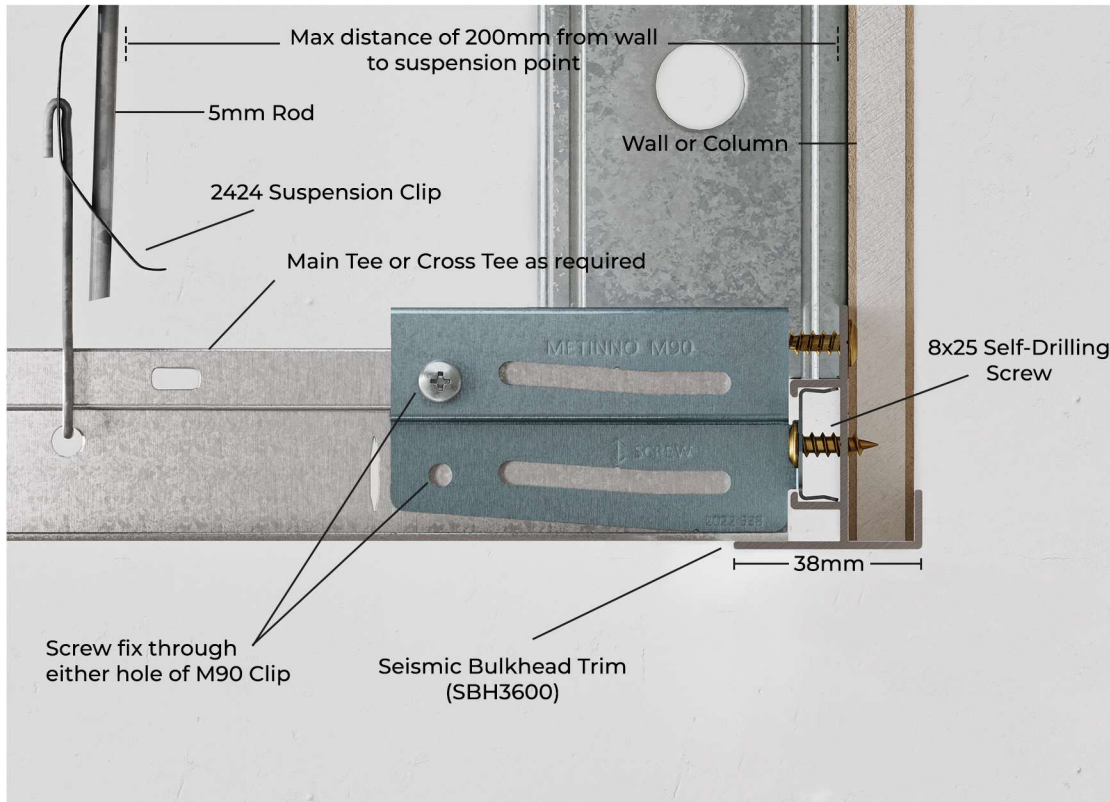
Fixed Ceiling-Wall Connection with M90 Clips
